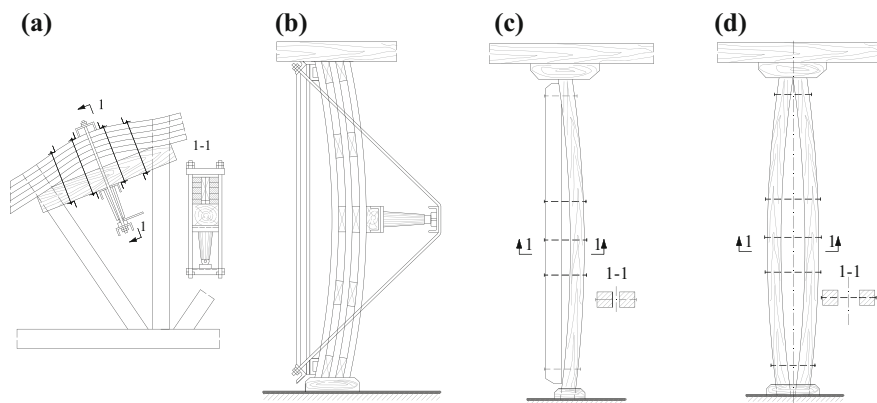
Strengthening of wooden elements under load, a compressed truss chord, b multi-branch post, c single-branch post, d two-branch post
